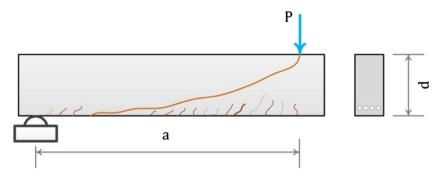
Shear failure of slender reinforced concrete beams without web reinforcement.
